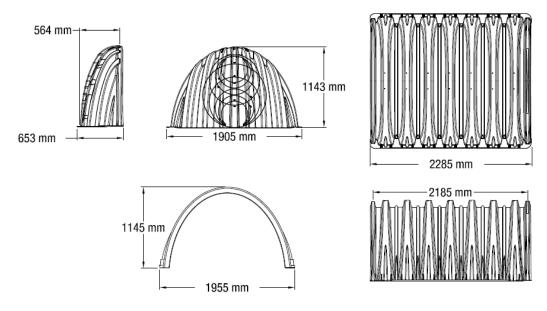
Dimensions of the STORMTECH MC3500 chamber (tolerance: 3%)
